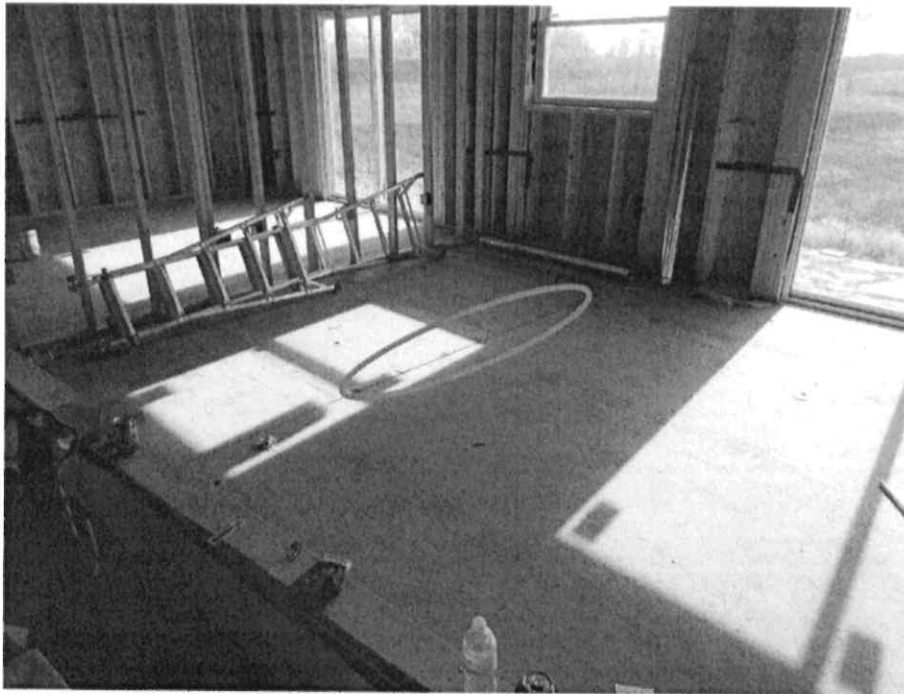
View of the Living Room area, with red oval added to identify the locations of spalls within the OSB subfloor.
